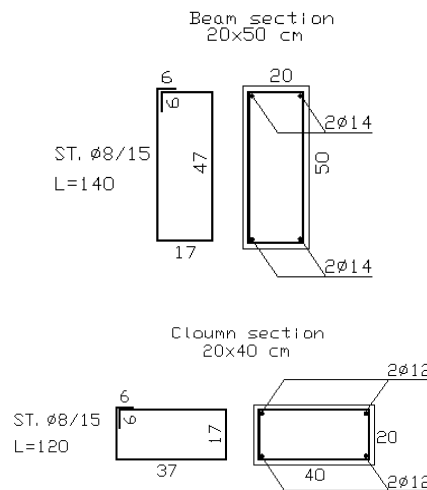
resistant sections of beams 50x20 cm (top) and columns 40x20 cm (bottom) of the frame (scale ratio 1:1)[cm]
